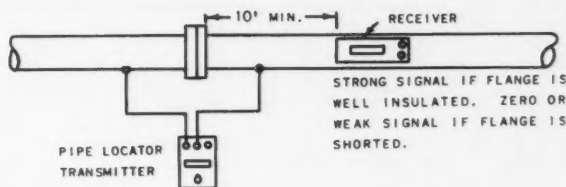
Locating defective flange insulation by the pipe locator method (large pipe).
